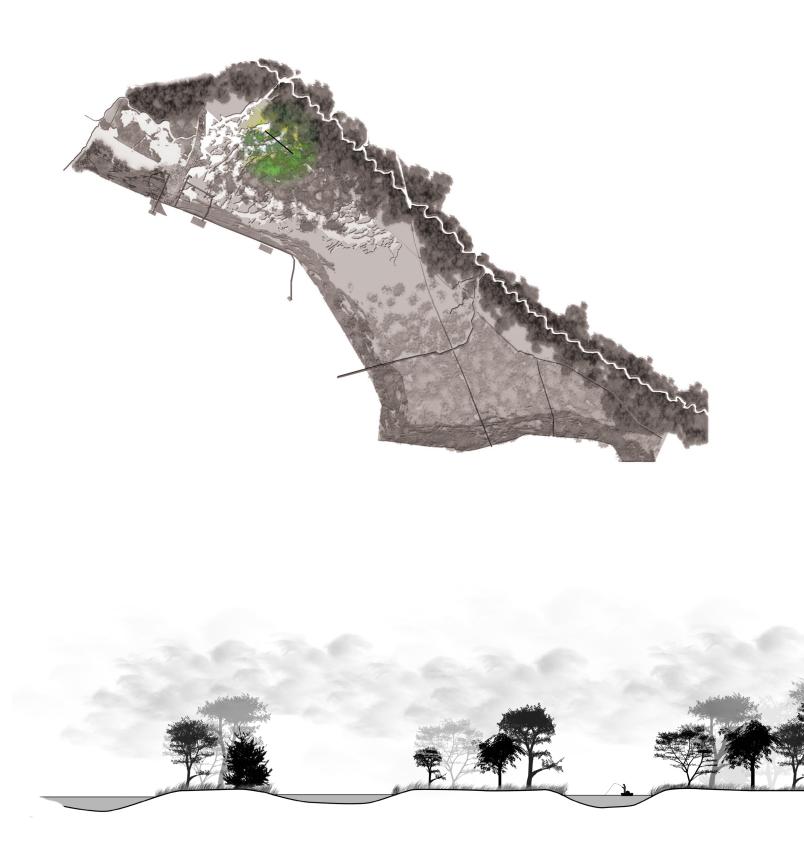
Typical cross-section created to show the intended topographic configuration with areas of soil placement for creating desired elevation above water line that would support woody wetland and tree species. Open areas of water would be interspersed between the elevated soil embankment providing for boating access and potential temporary detention of seasonal storm water.
